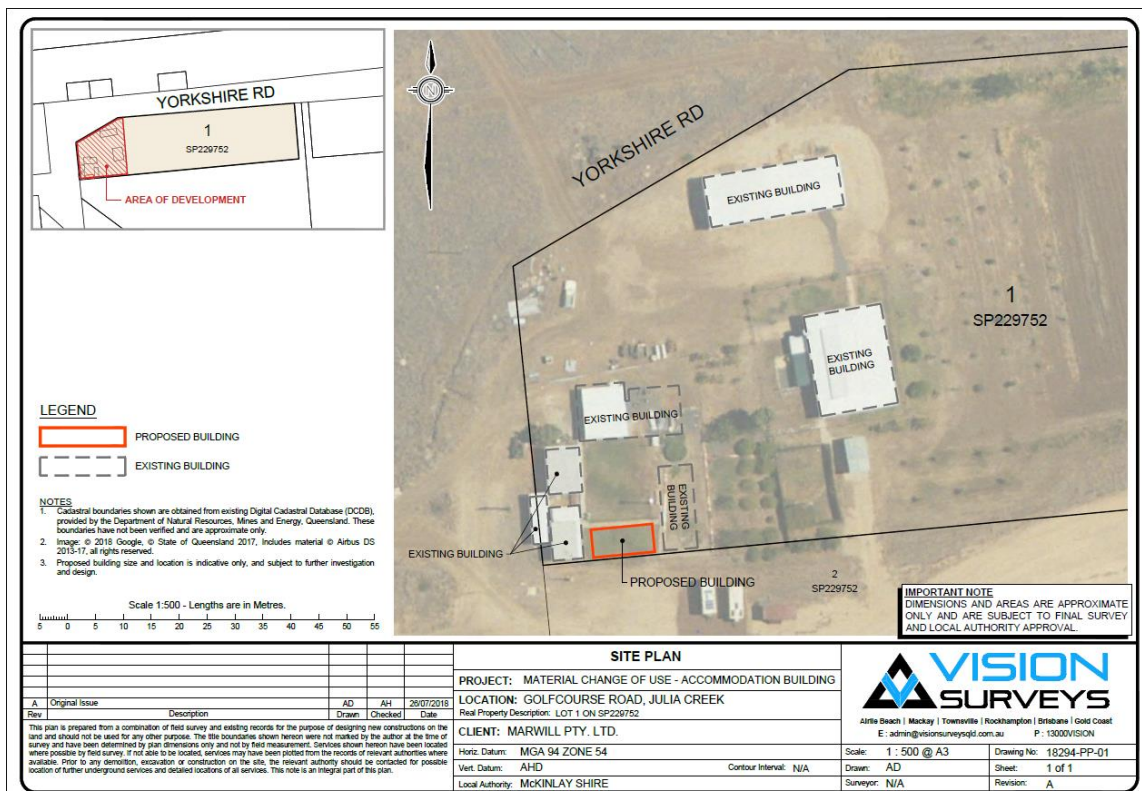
Extract Approved Proposal Plan (Source: VSQ)
